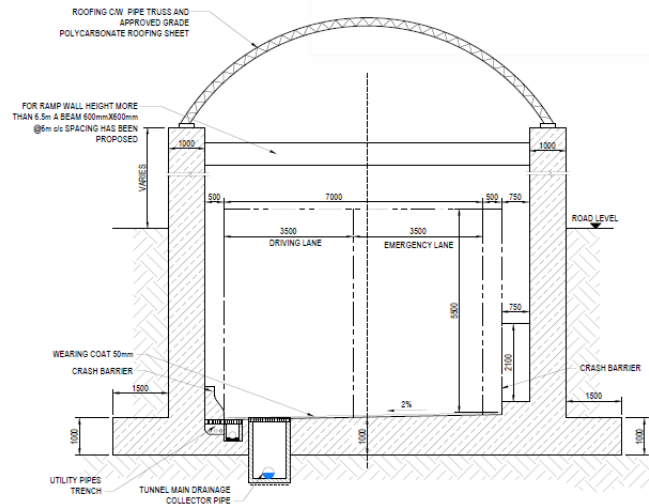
Typical Cross Section RAMP Structure (2 LANE)
